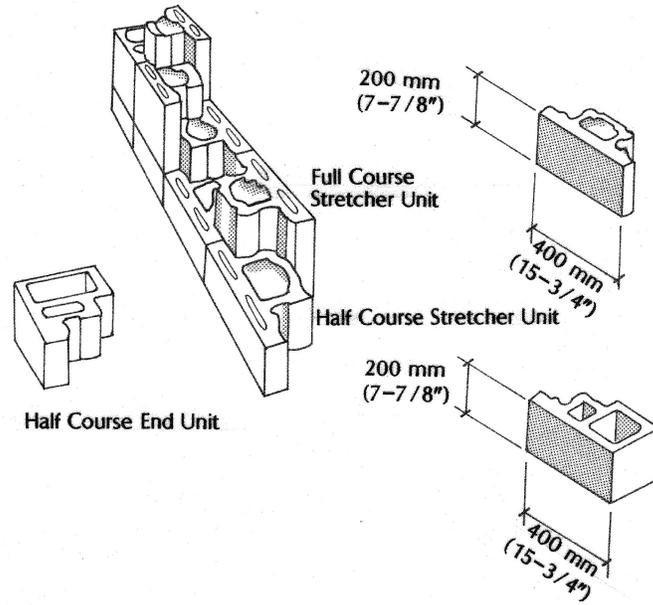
"System Two" drystack interlocking concrete masonry units.
